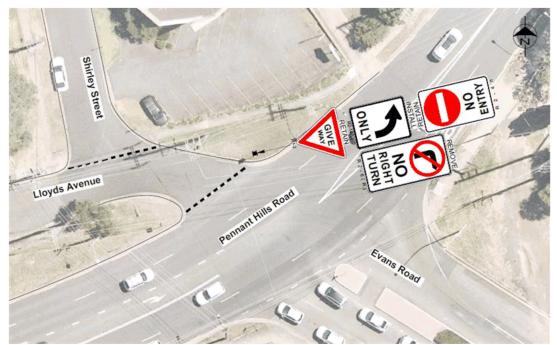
Concept plan of the proposed 'All Traffic Left Turn Only' restriction in Lloyds Avenue at Pennant Hills Road and Evans Road, Carlingford
